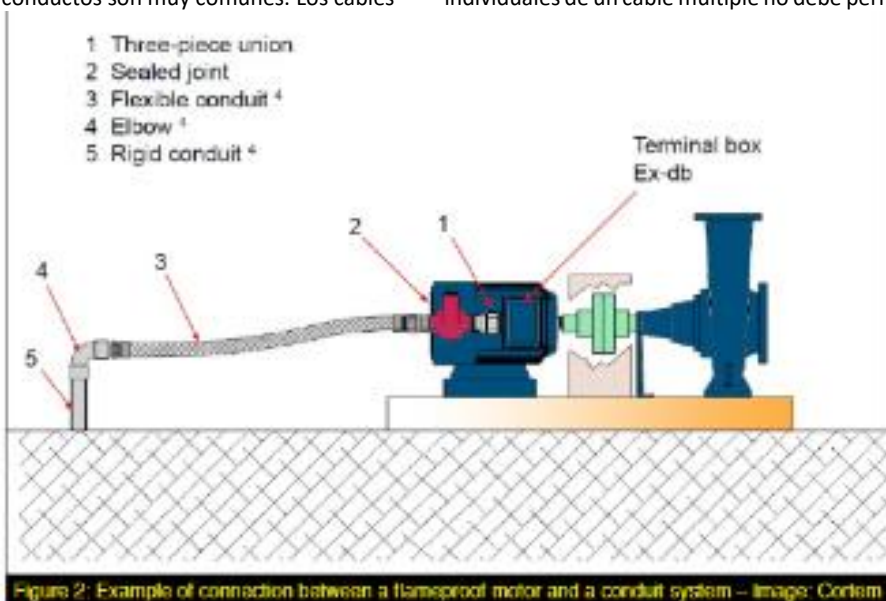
Example of connection between a flameproof motor and a conduit system – image: Corsem
